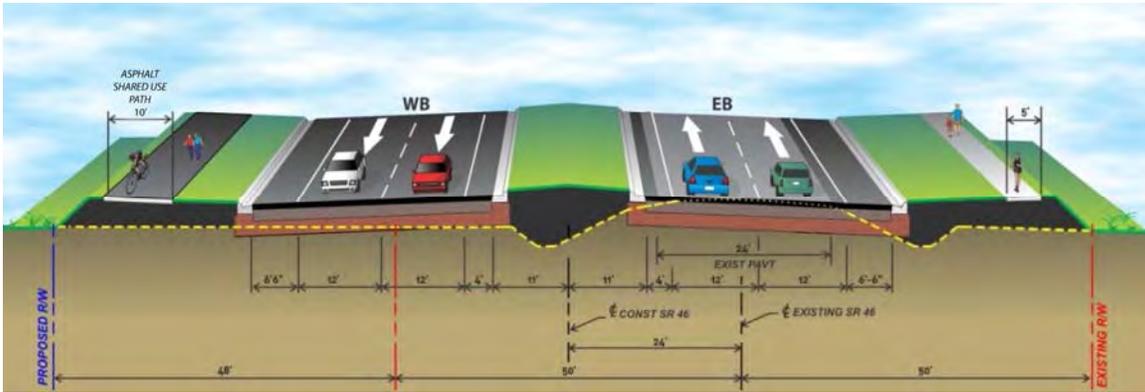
Suburban Typical Section-Widen to the North
